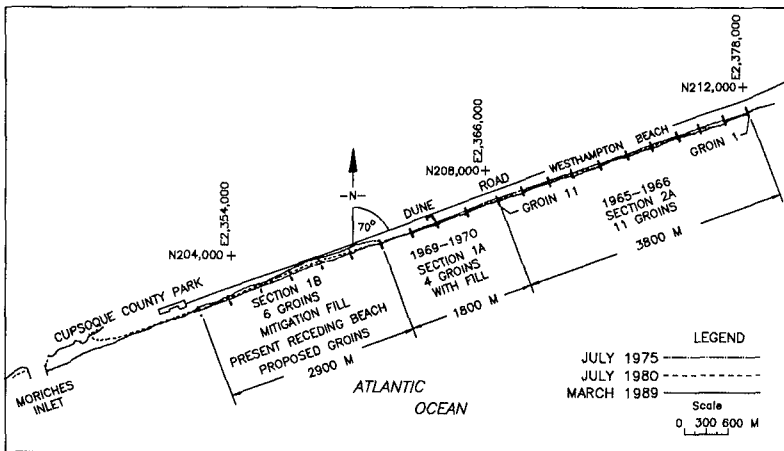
Construction plan for the Westhampton Beach shore-protection project
